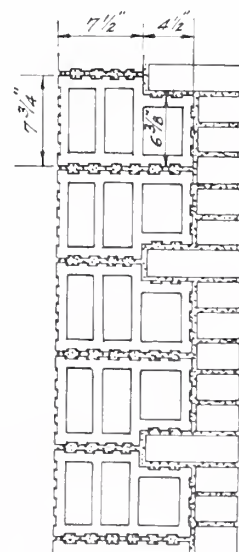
Cross section of sixteen-inch PERFECTION backed brick veneer wall.
